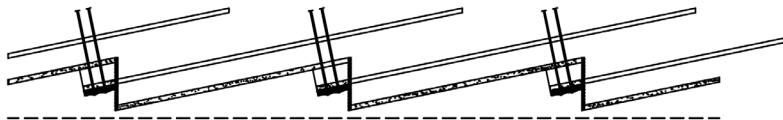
Cross section of the pipe umbrella support in the main tunnel
